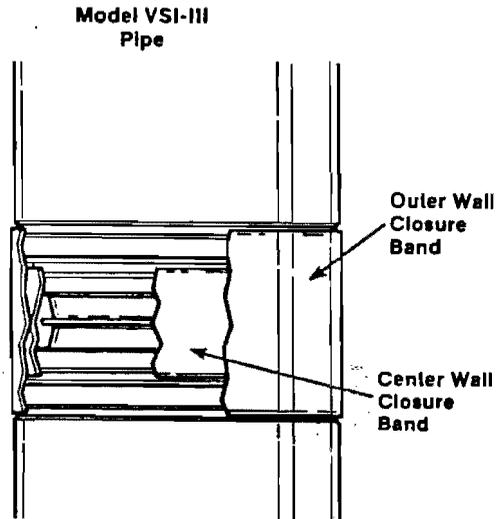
Basic Assembly Step 7: Triple Wall Systems only. Install Closure Band between adjoining outer walls, bridges center wall gap.
